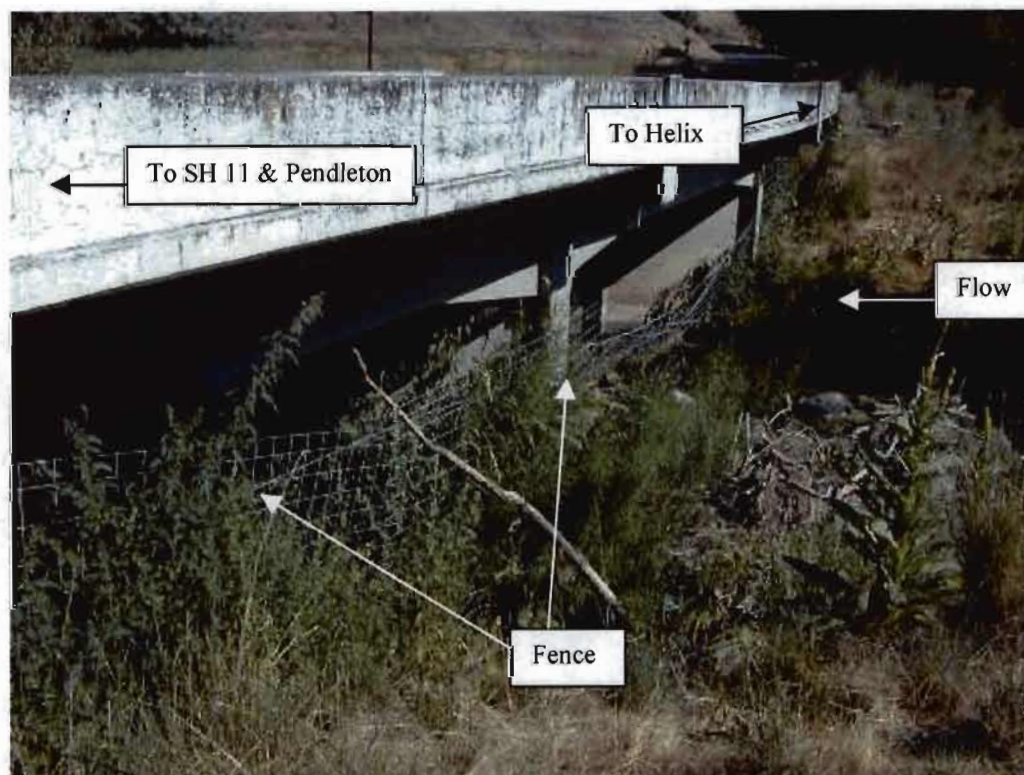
View looks downstream at the u/s side of bridge, showing fence, possible obstruction to debris during flood.
